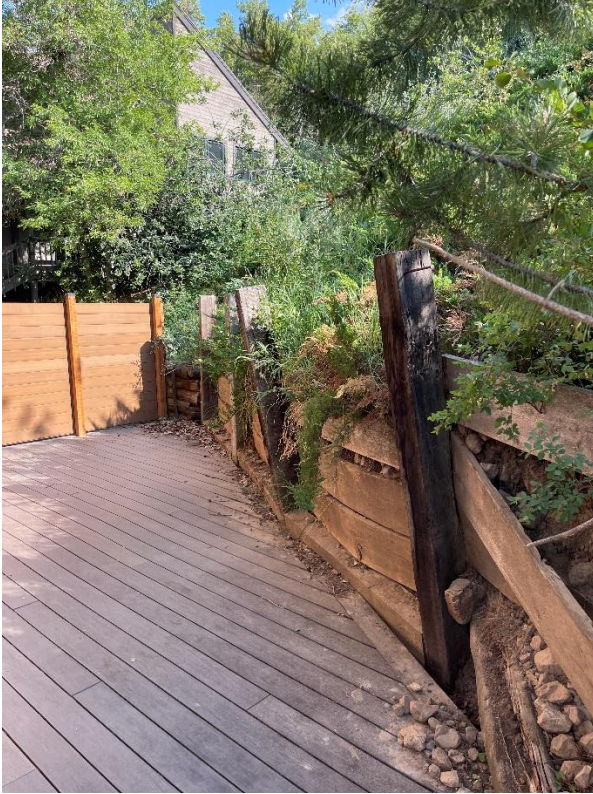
& 2: Applicant's photos showing existing failing wood retaining wall at 430 Deer Valley Loop.
